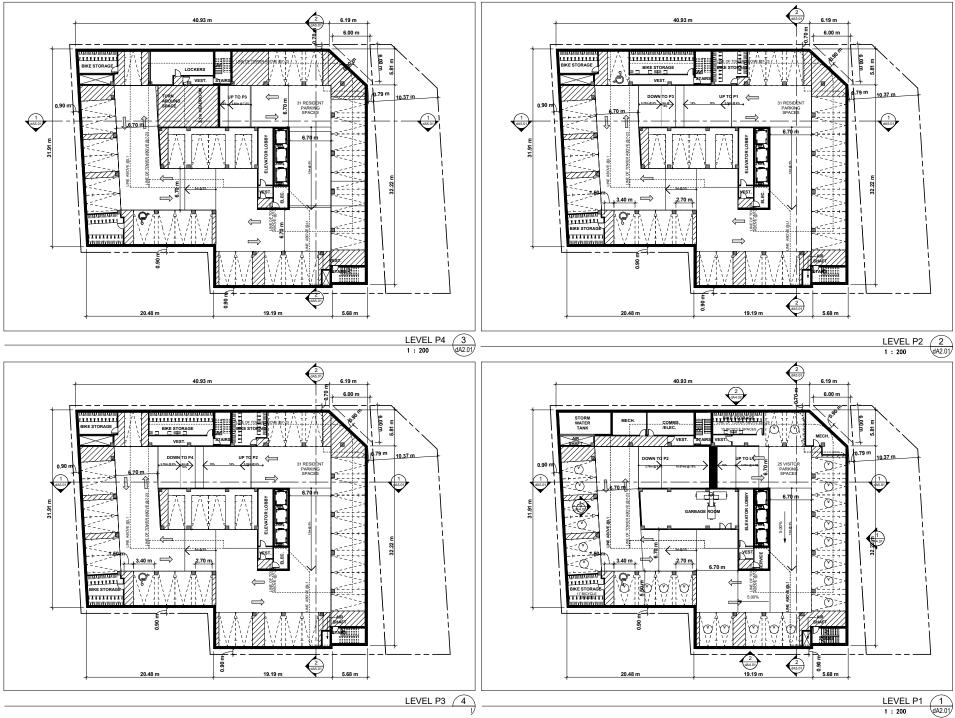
Floor Plans prepared by Kirkor Architects and Planners
